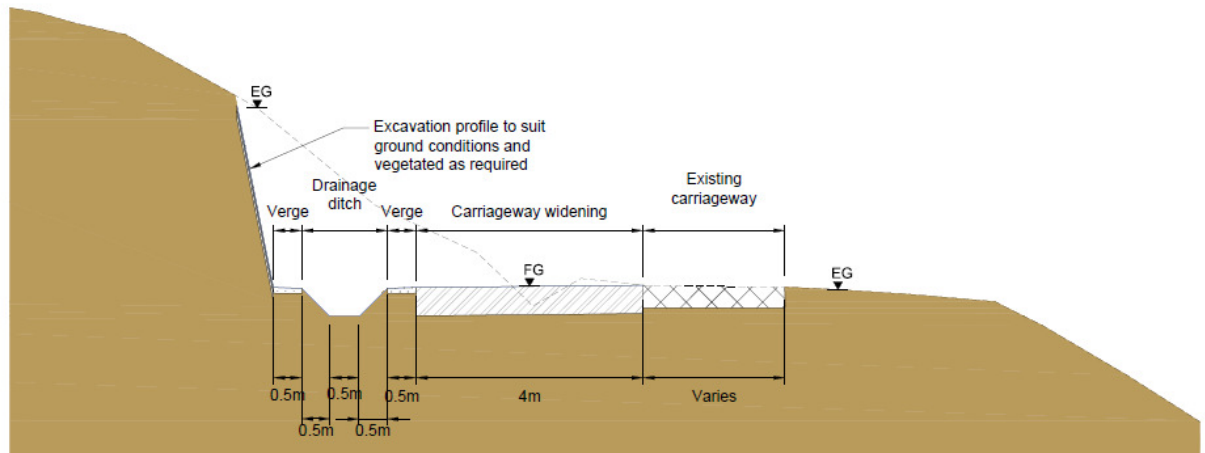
Typical C1144 section through proposed C1144 widening.
